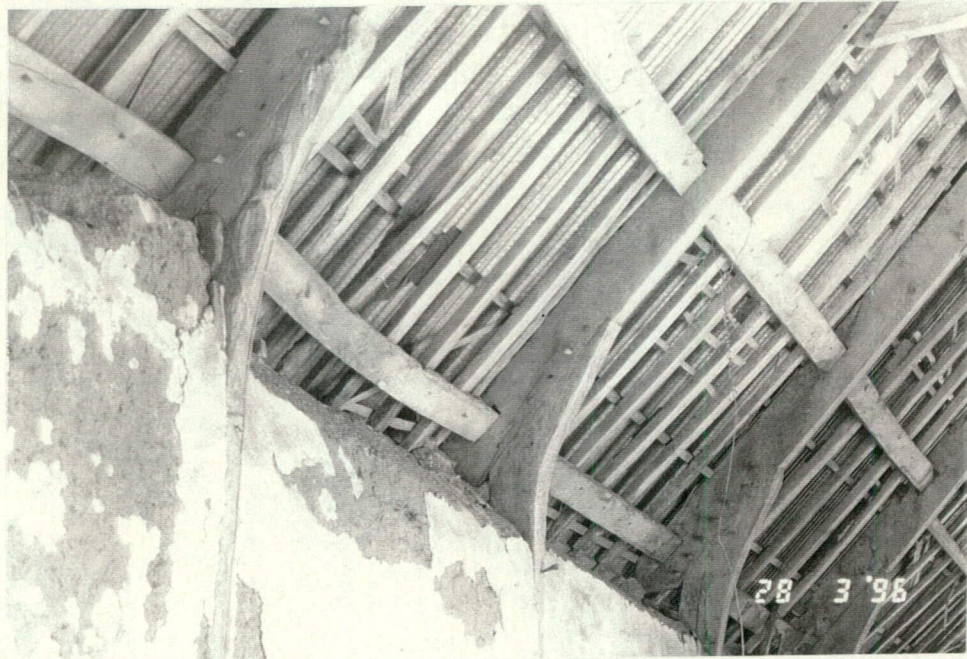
The stub of the original southwest end wall shows on the southeast side.
